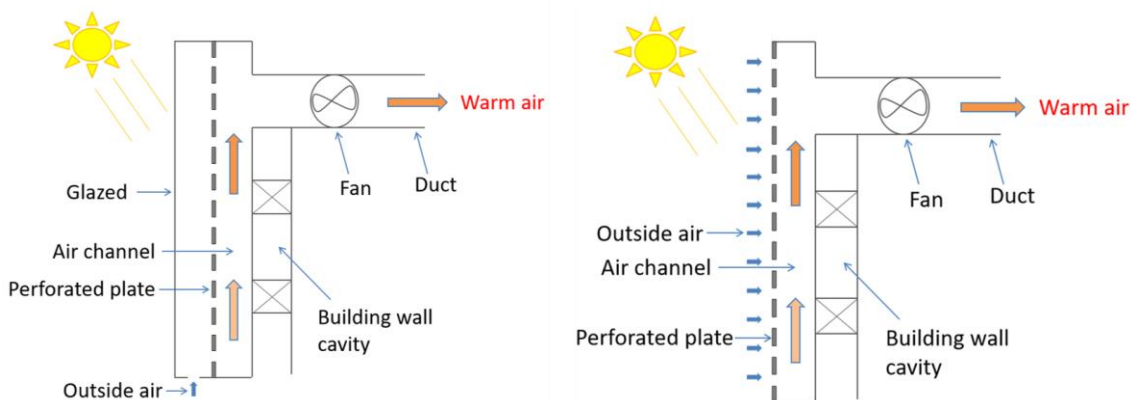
Diagram of a vertically installed glazed solar wall (left) and an unglazed solar wall (right)
